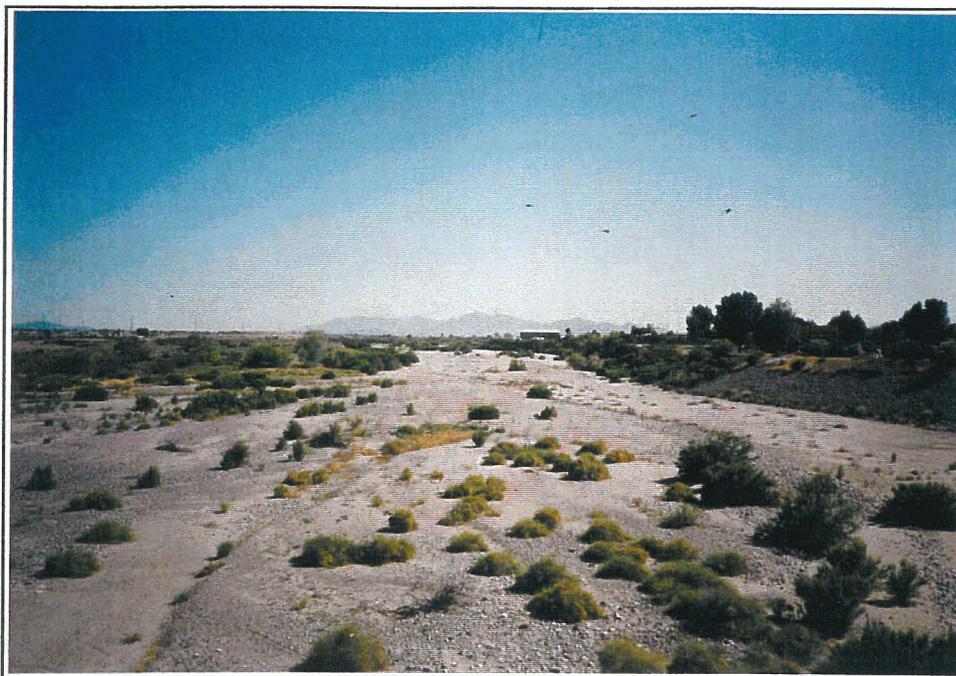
View looking downstream from bridge deck. Note primary low flow channel toward rip-rap along west bank and additional channel forms joining from the east in a generally braided form. Also note middle bar dividing the low flow channels.
